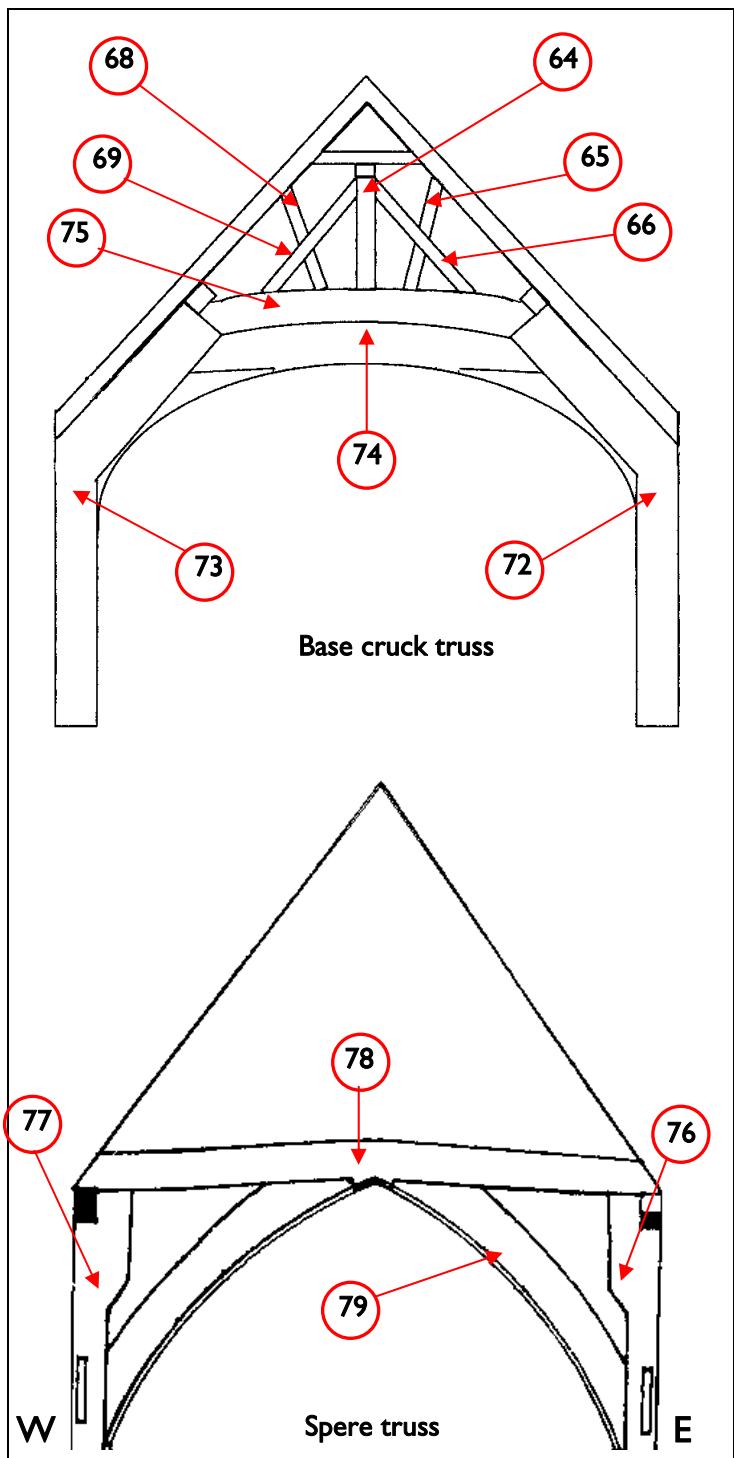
Great Hall trusses to show timbers sampled (after Jones 1975–76)
